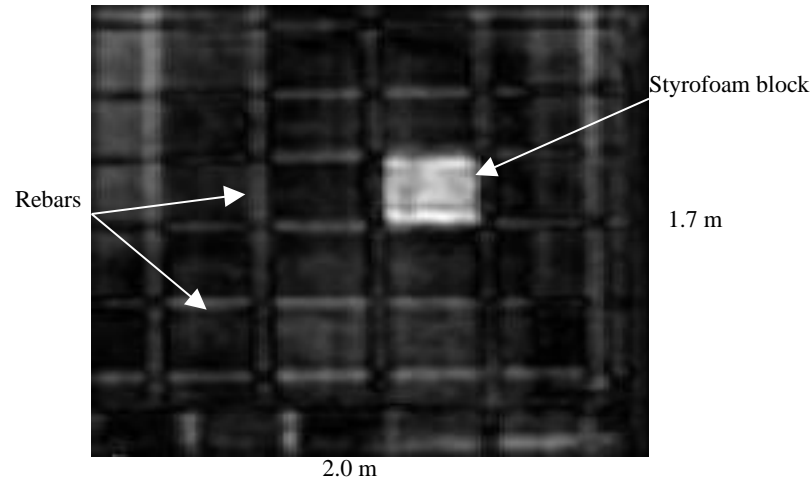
PERES reconstructed plane from data collected over a reinforced concrete slab with simulated void.
